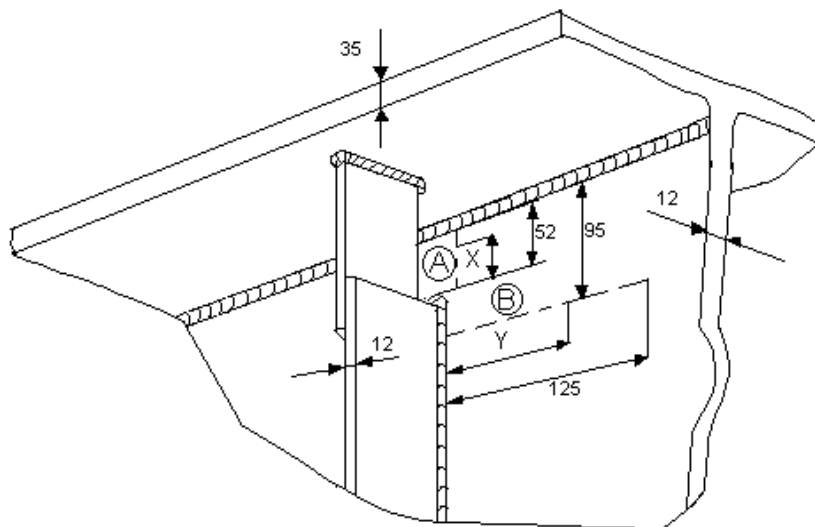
Fragment of the railway welded bridge span:
